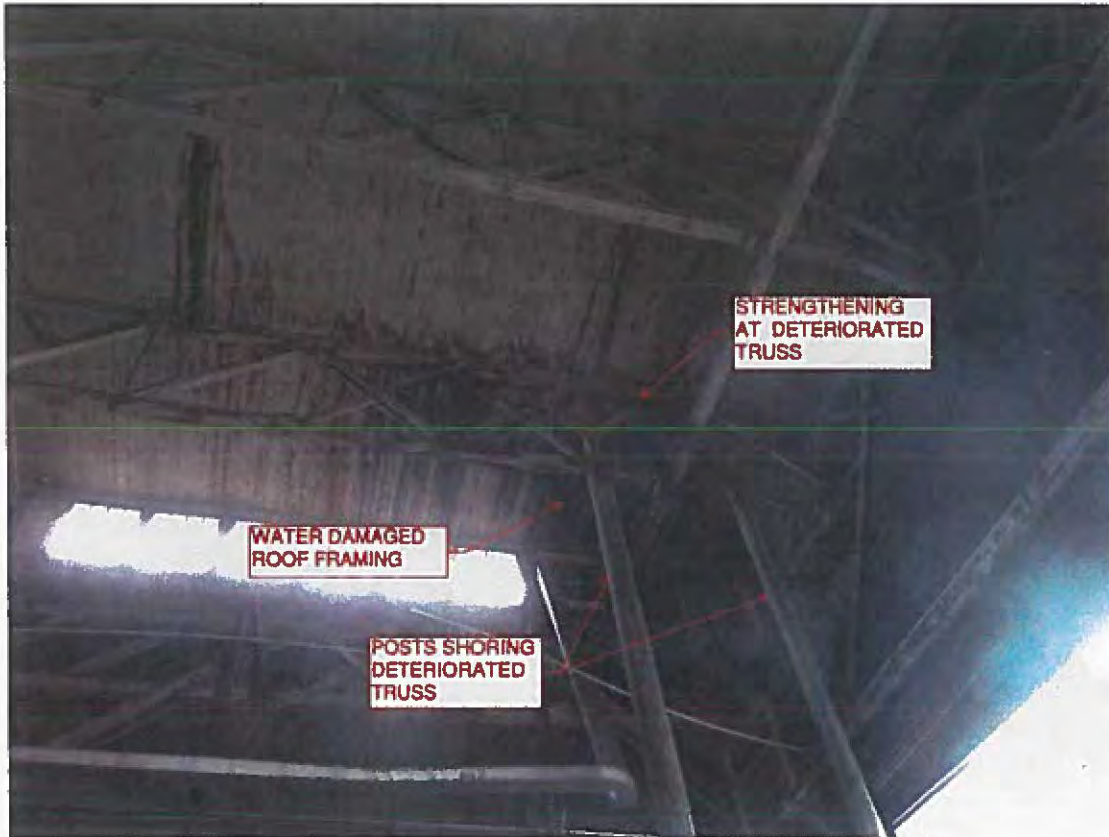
Temporary shoring at damaged roof truss and framing, installed April 2017.
